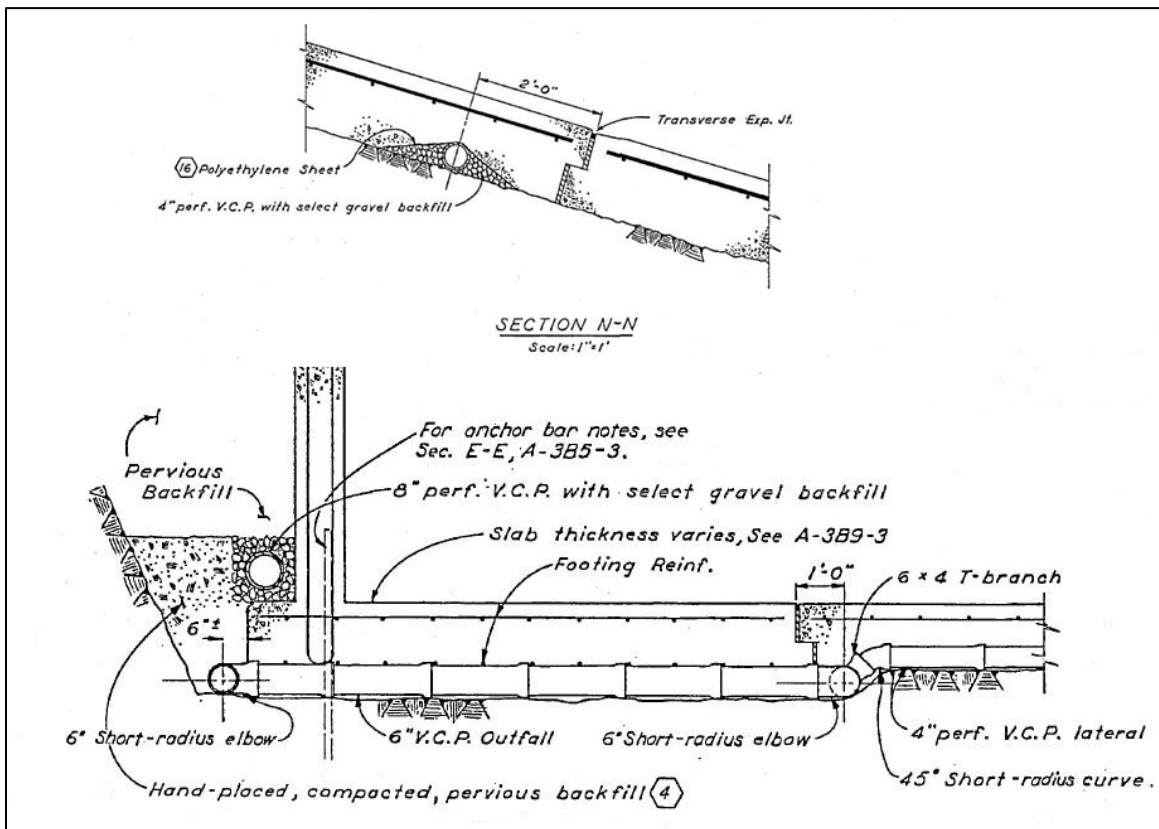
Original Lateral Drain Details from the Bid Specifications Drawing A-3B9-1
